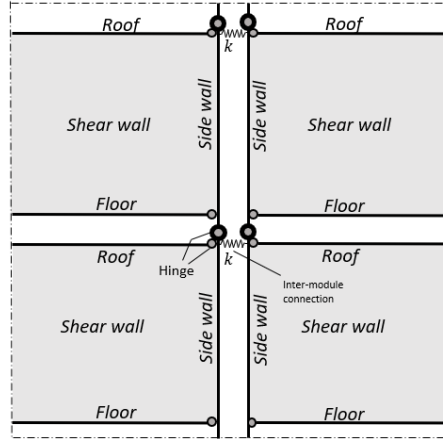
Modelling detail of horizontal and vertical connected modules
